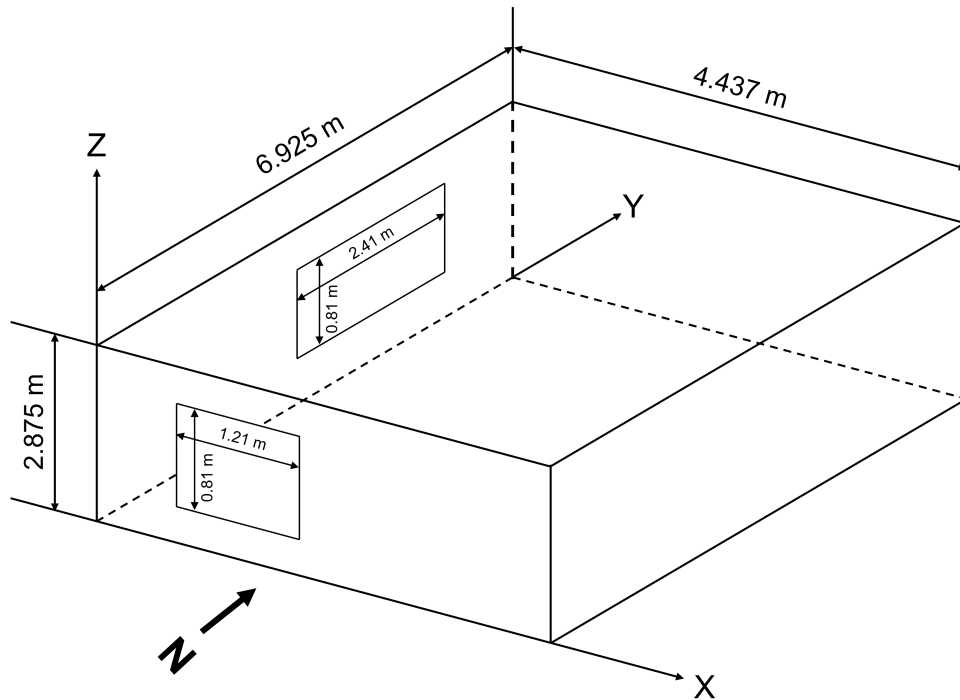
Sketch of the laboratory room geometry used in the model (not to scale). North direction is labelled at the bottom.
